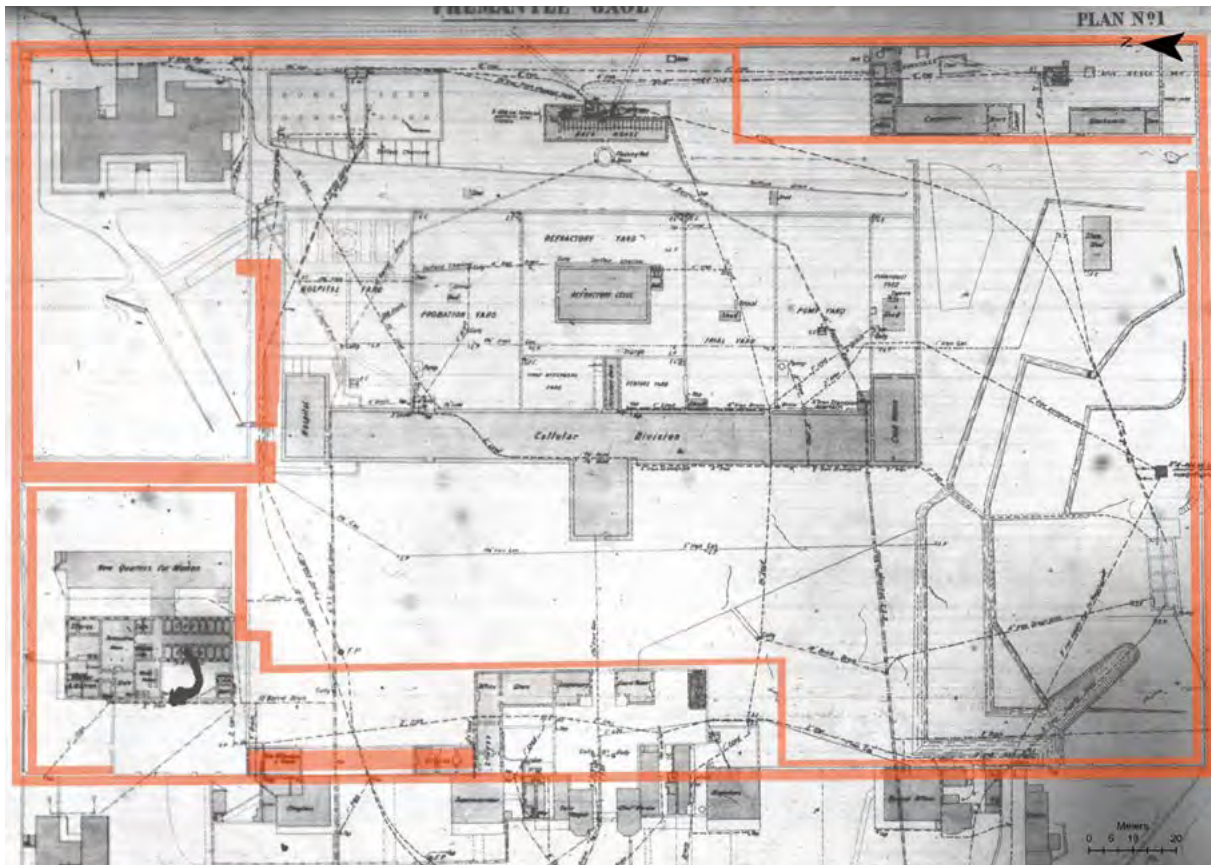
The site plan from 1898 shows two structures on the western edge of this zone. The structures are labelled as Stores, and the First Offenders Room. Later plans show this area has been variously labelled for storage, with some divisions in the area shown, but no clear evidence that structures persist.
